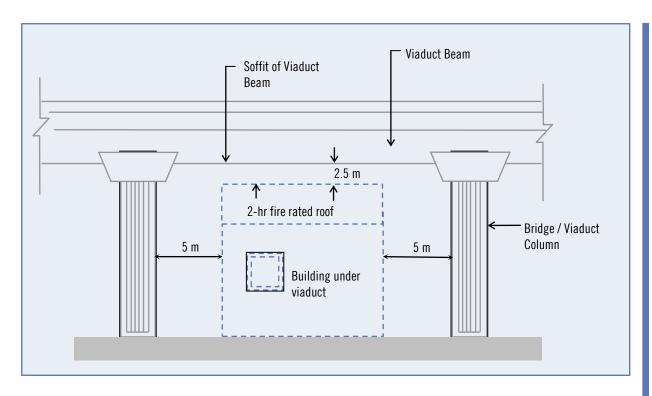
Clearance of Building Roof Below Bridge/Viaduct (Longitudinal Section)
